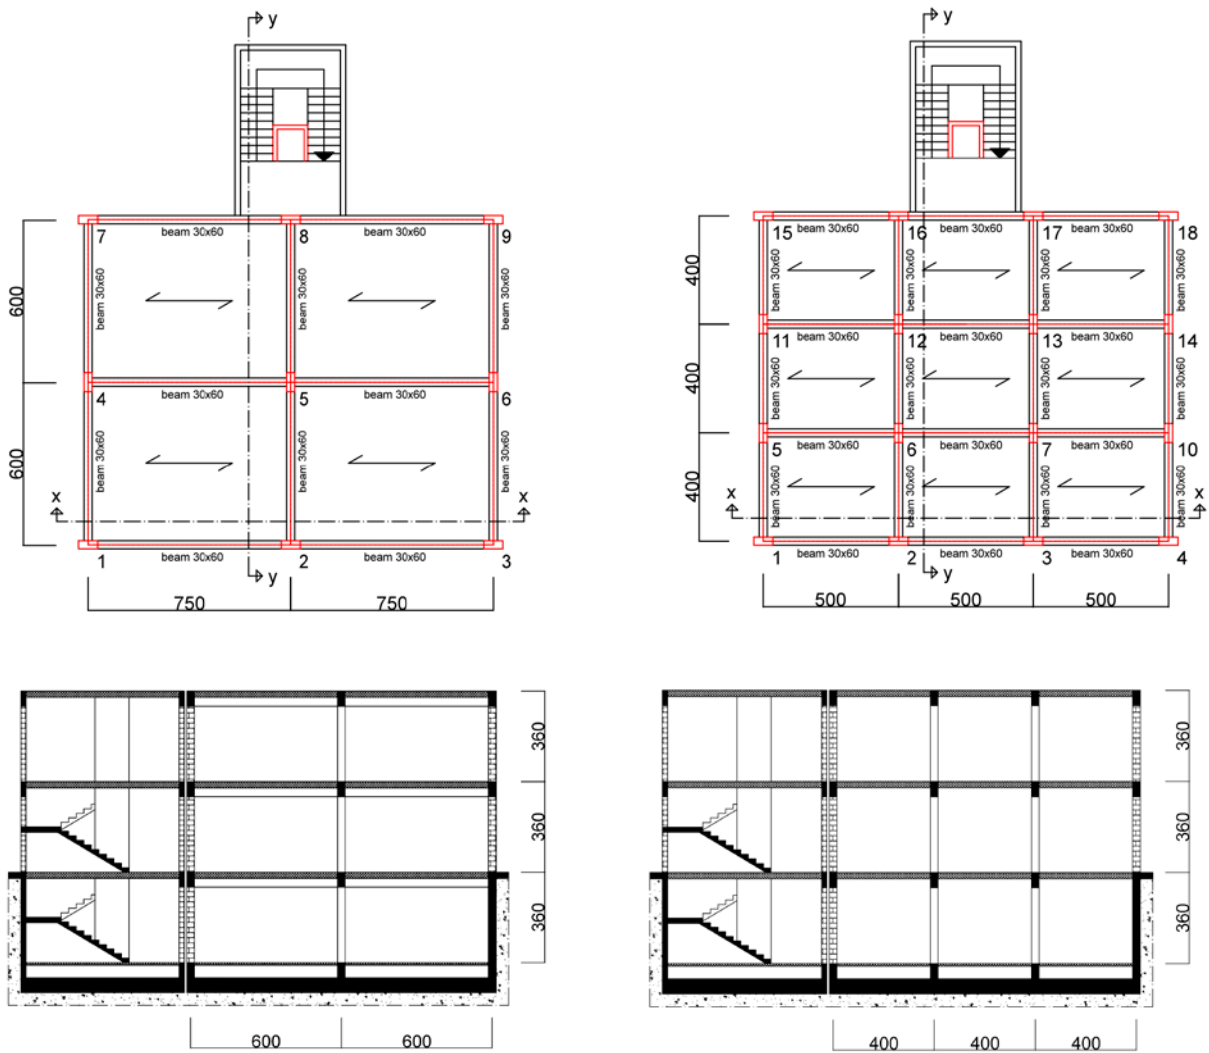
Case building 3: structural plan and section Y, isolated version (left) vs fixed base (right).
